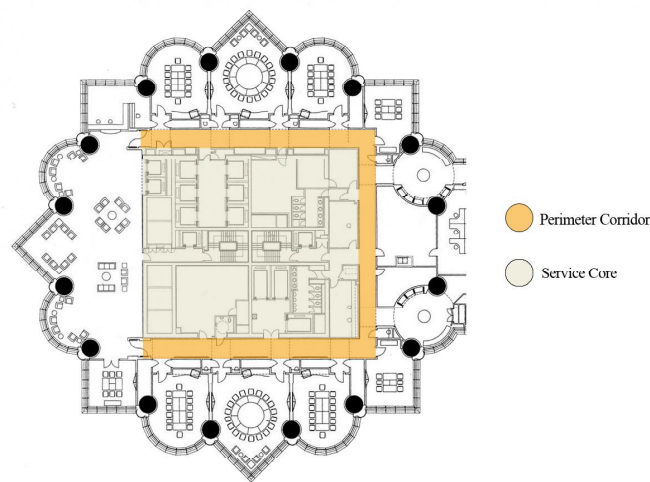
Petronas Tower 40th floor plan (Pelli and Crosbi, 2001)
